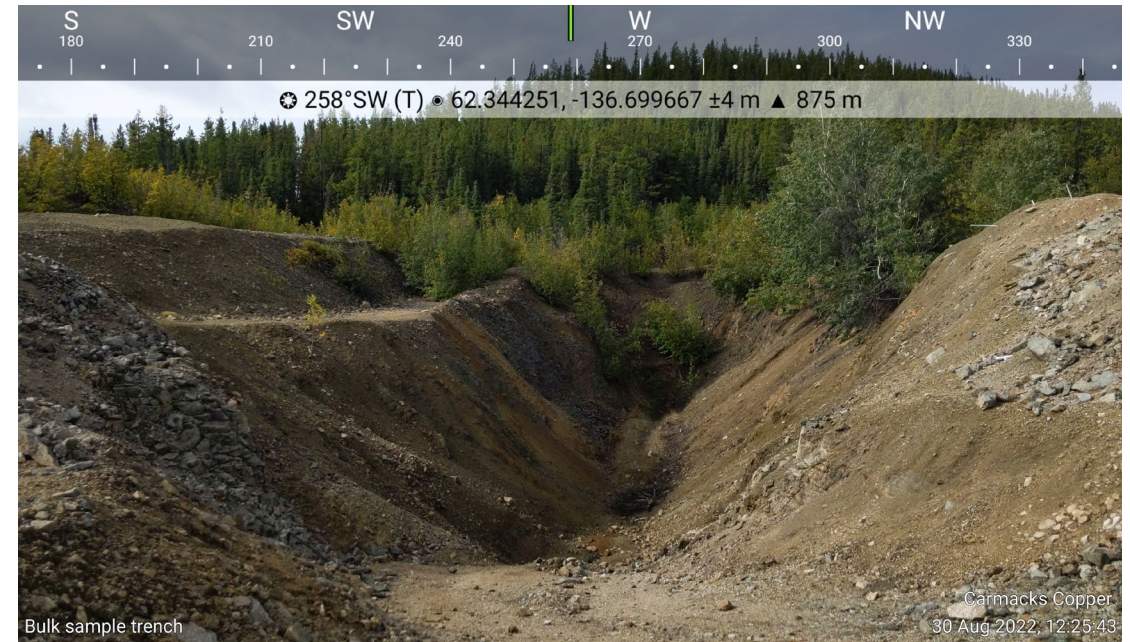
Bulk sample trench – sides of trench are sloped and benched, trench is in satisfactory condition
